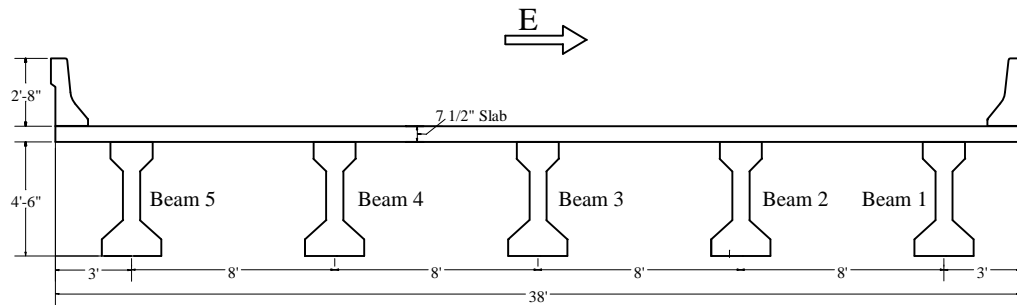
Cross Section of the Instrumented Span - Slaughter Creek Bridge
